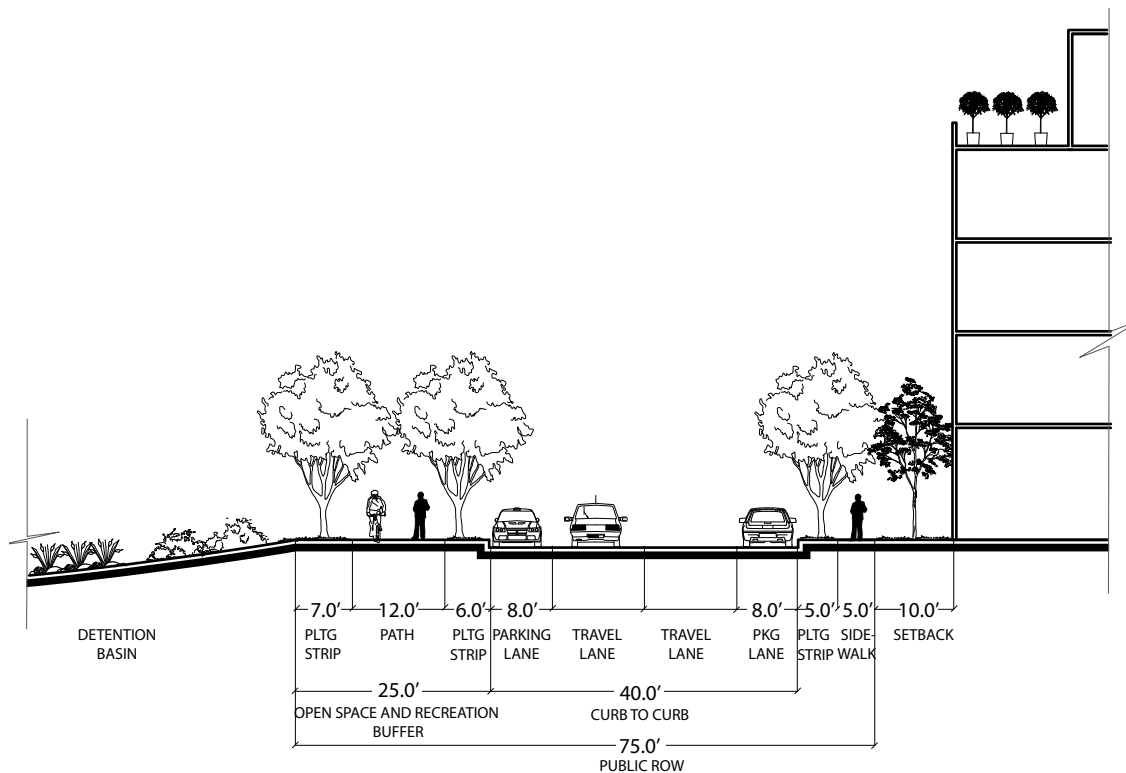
Oakley Road between Phillips Lane and Willow Avenue
